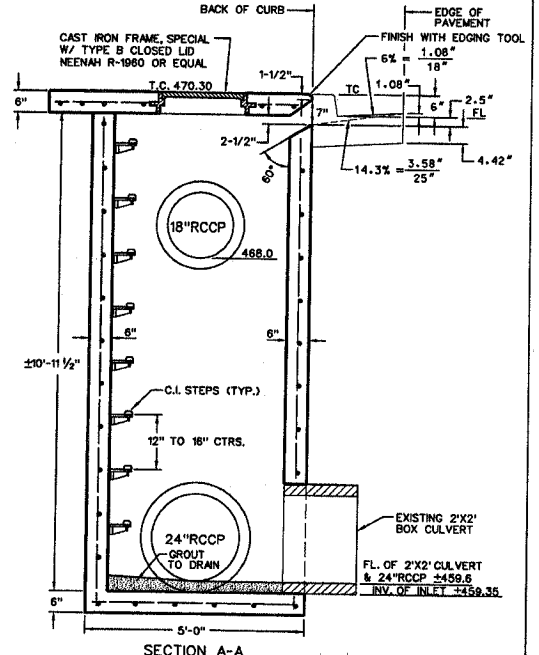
DETAIL - INLET BOX, SPECIAL, NO.3 (4'x5')
